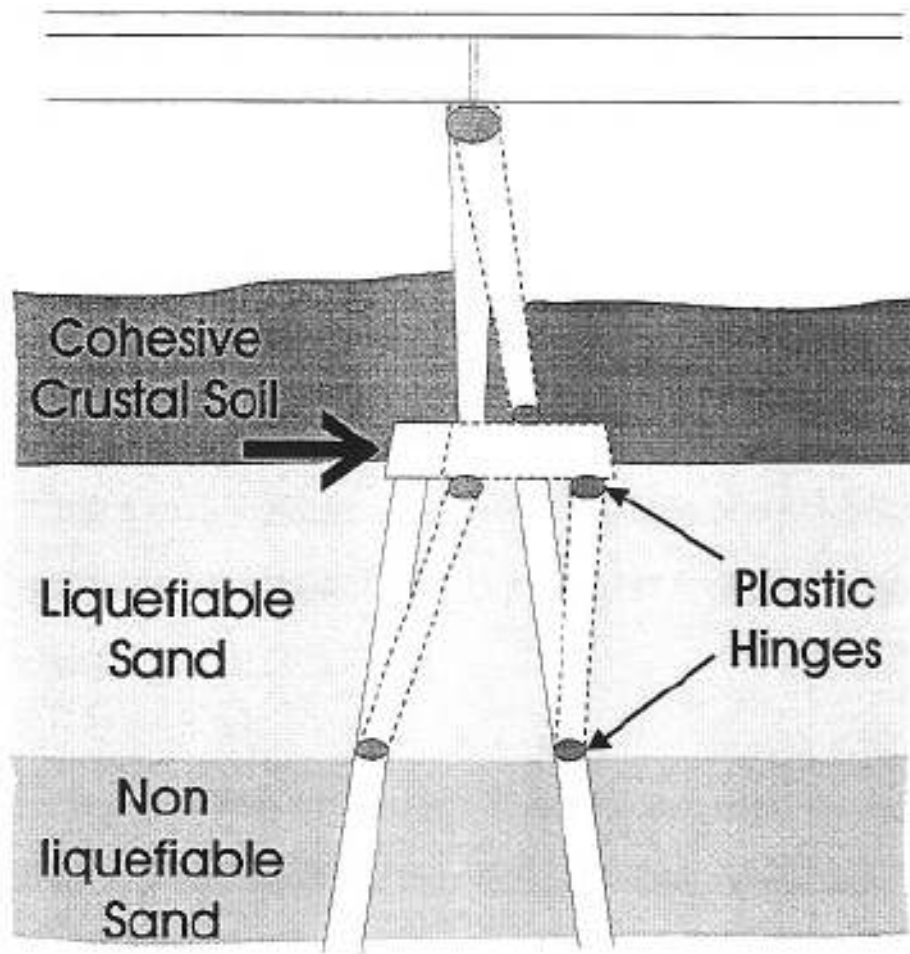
Pile Collapse Mechanism, Landing Road Bridge (Keenan, 1996)
